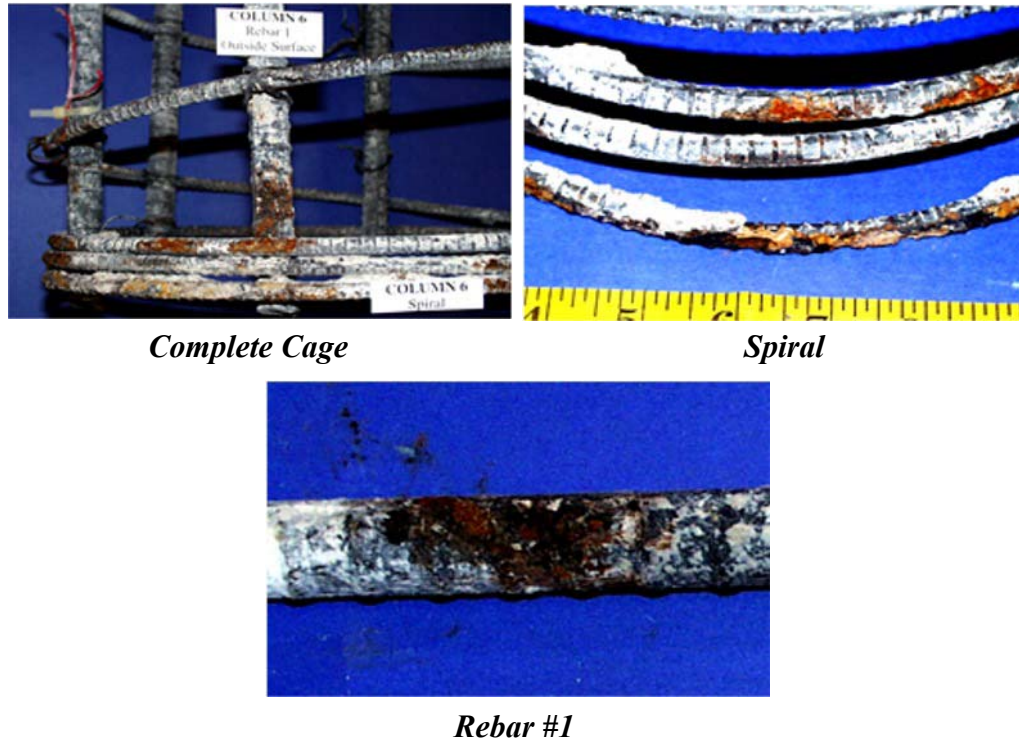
Reinforcement Condition for Specimen NJ-TC-S
